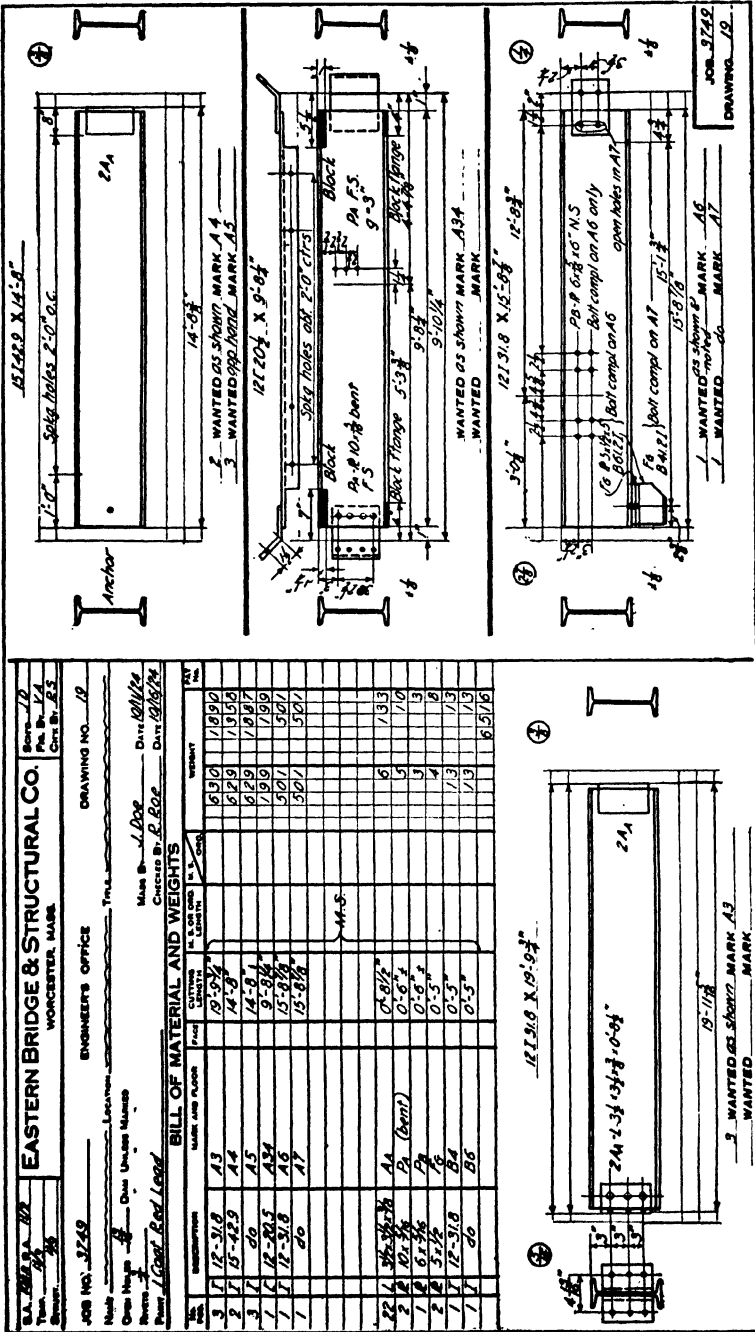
Shop Bill and Details for Steel Beams. (Courtesy Eastern Bridge and Structural Co.)
